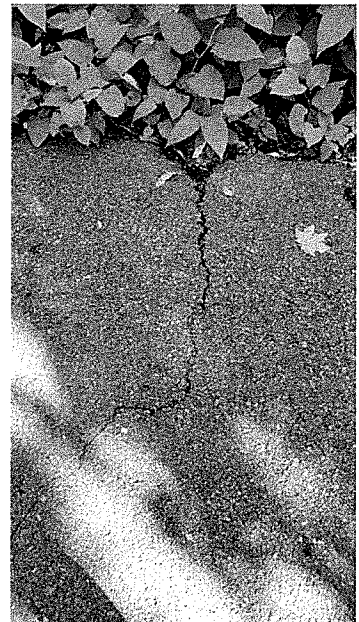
A crack in the bikeway surface next to a stand of Japanese Knotweed
